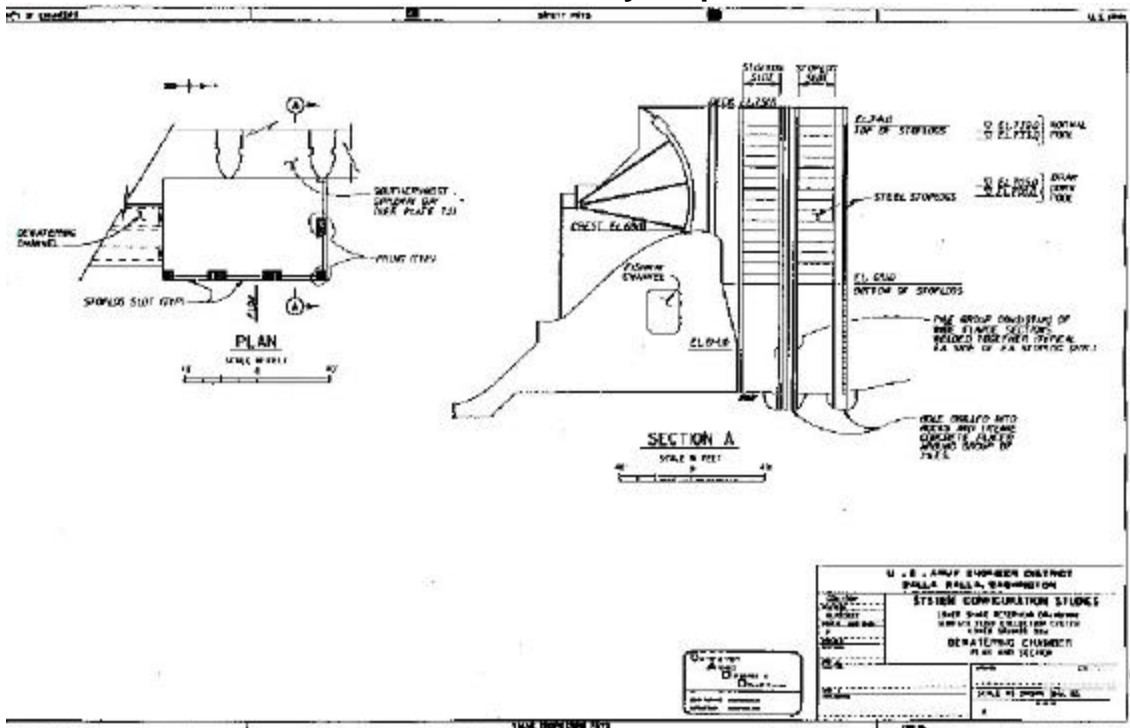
Surface Flow Collection System--Dewatering Chamber Plan and Section
